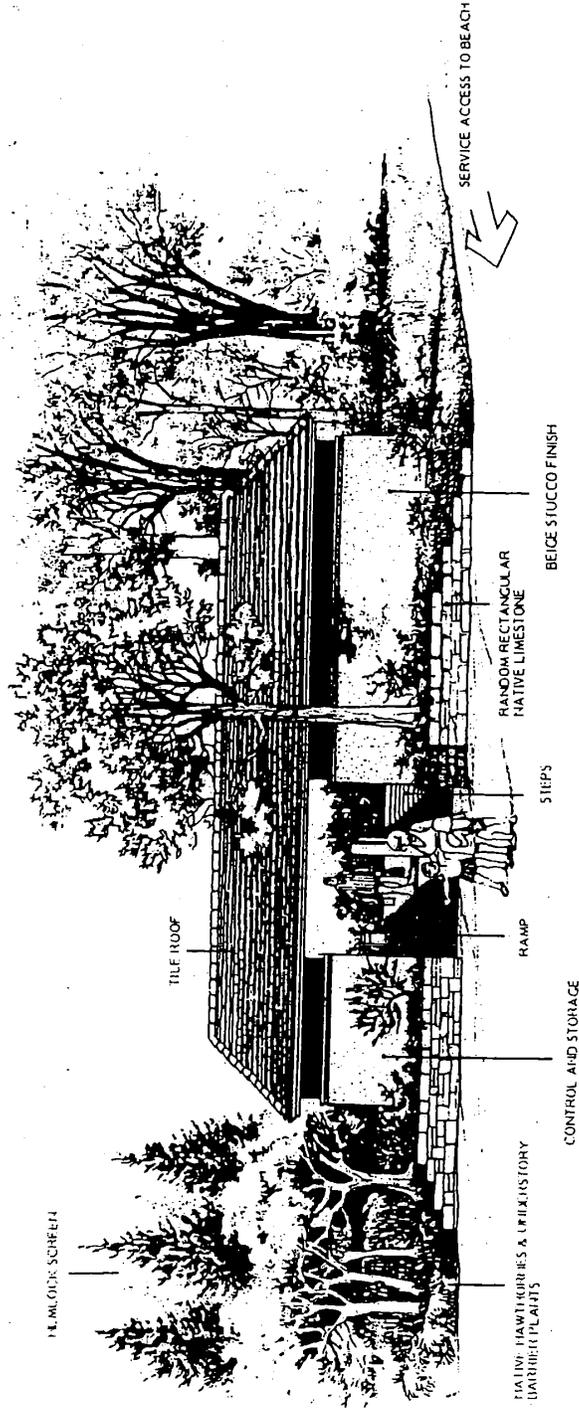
LIGHTHOUSE LANDING COMFORT STATION ELEVATION NORTH
